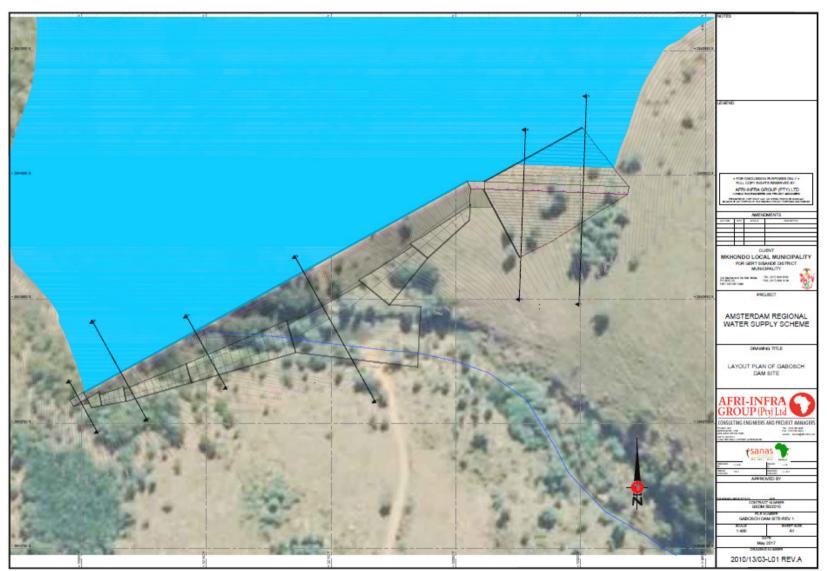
Option 1 - location of the cross-sections through the proposed Dam B dam wall.
